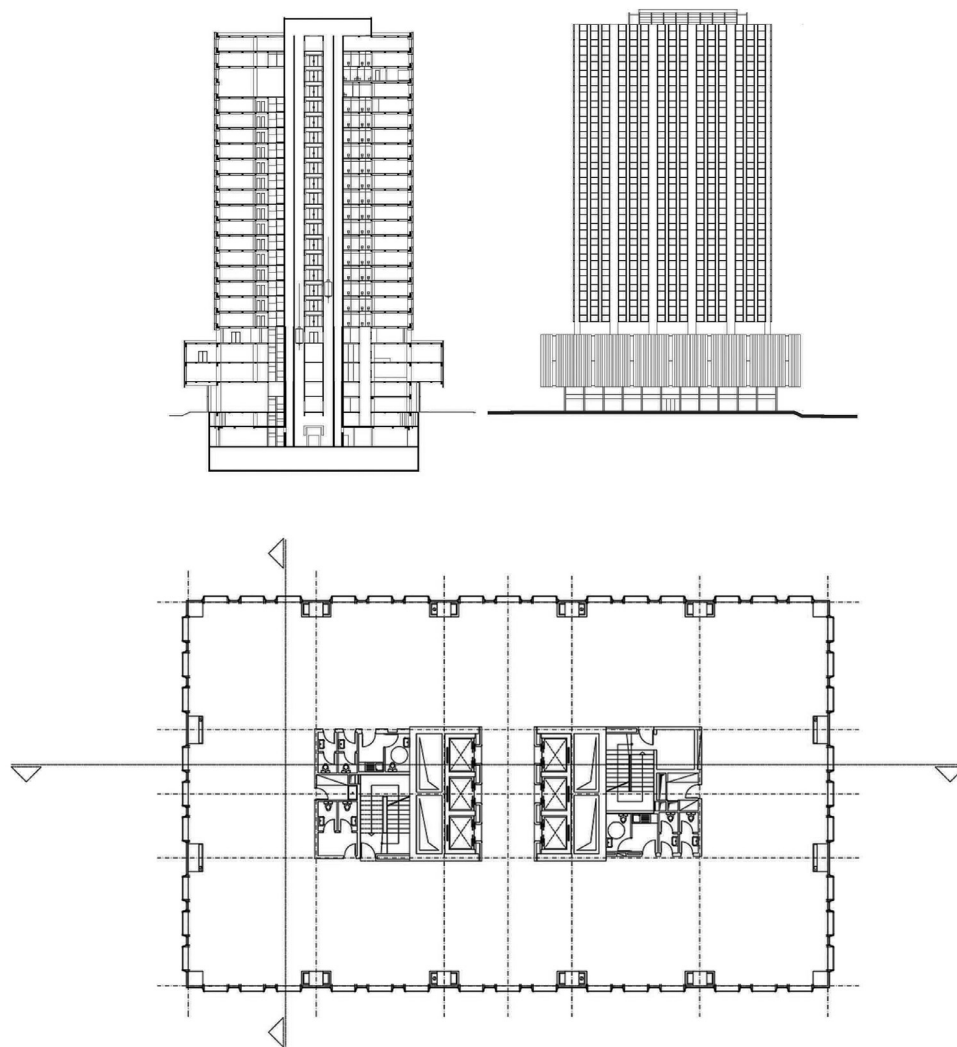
Case study building plans, from upper left corner clockwise: section, elevation and typical floor plan.
